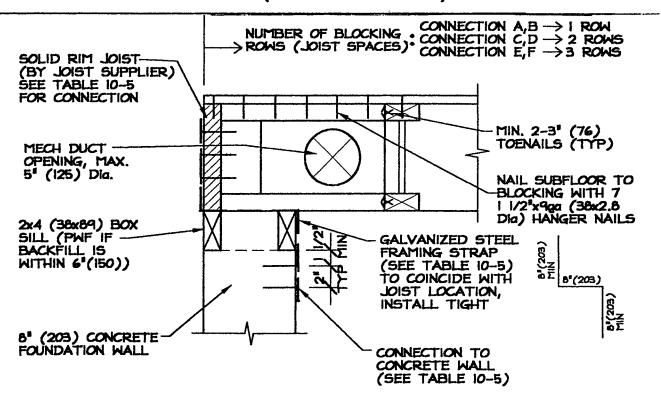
A - LATERAL BLOCKING, ENDWALL CONDITION (WOOD I-JOIST SYSTEM)
